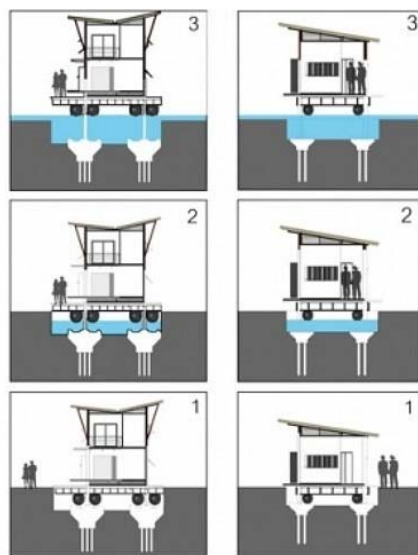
Prefabricated steel floating system of Amphibious House (Drawings by Site-Specific Co. Ltd.) [15]
